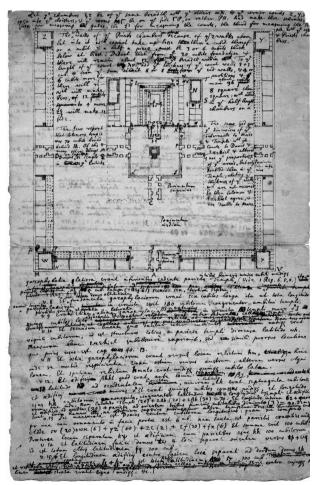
Newton's sketch plan of Solomon's Temple, Babson MS 434, fol. 8.
